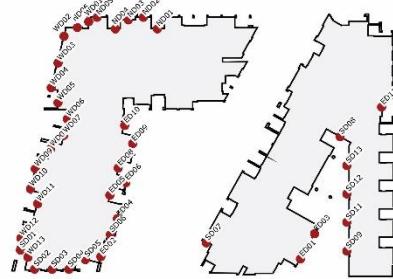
Layout of Pressure Sensors – Level 2 Plan
